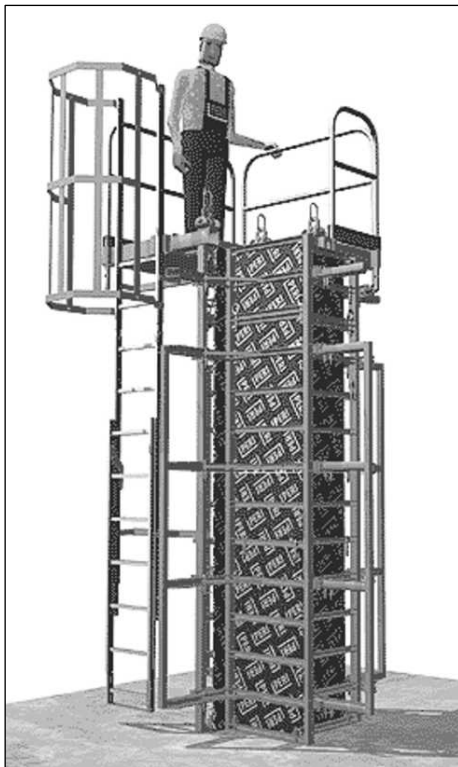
A typical Quattro Column Formwork (Courtesy PERI).
